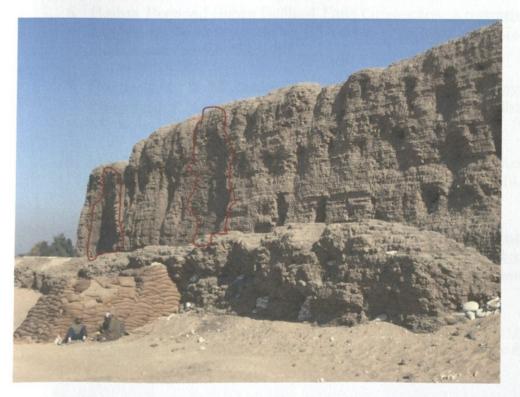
The character of the original walls is reflected in the stabilization of the north end of the west wall in the area where two large Coptic cells were stabilized. The reconstructed sections are outlined in red.
